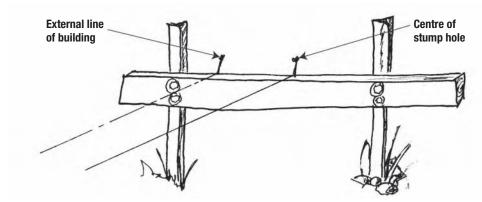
Profile hurdle for the location of the stump holes and the outside line of the building
